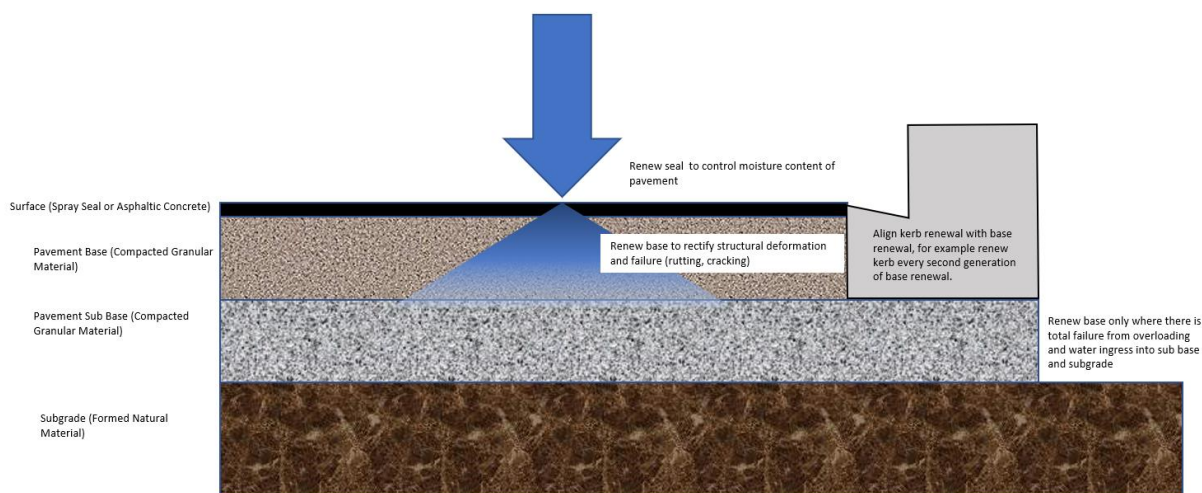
Road Pavement Renewal for Light Traffic Pavements (sub base is never renewed)
